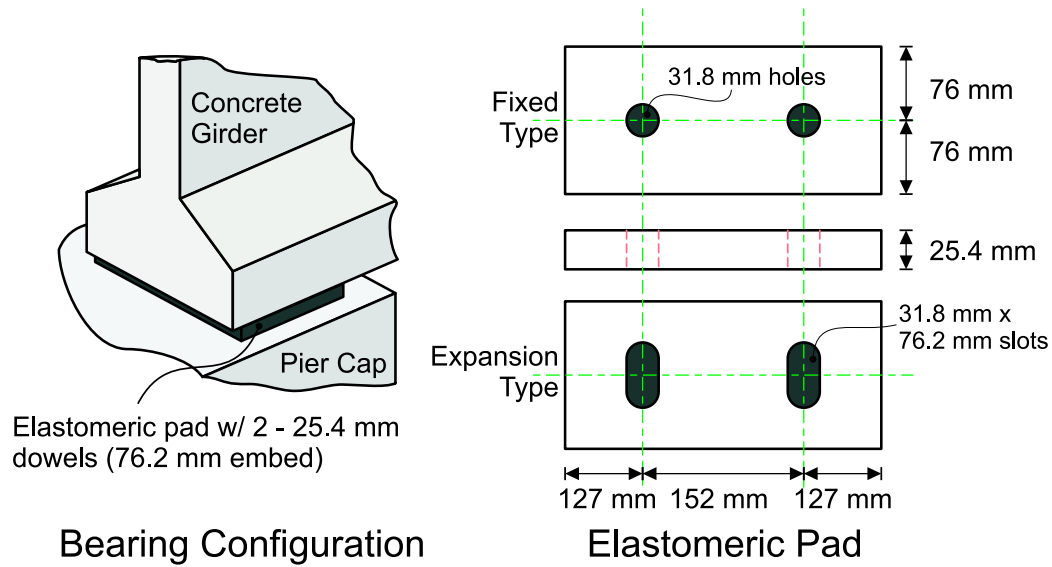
Typical Elastomeric Bearing Used for Concrete Bridge Girders.
